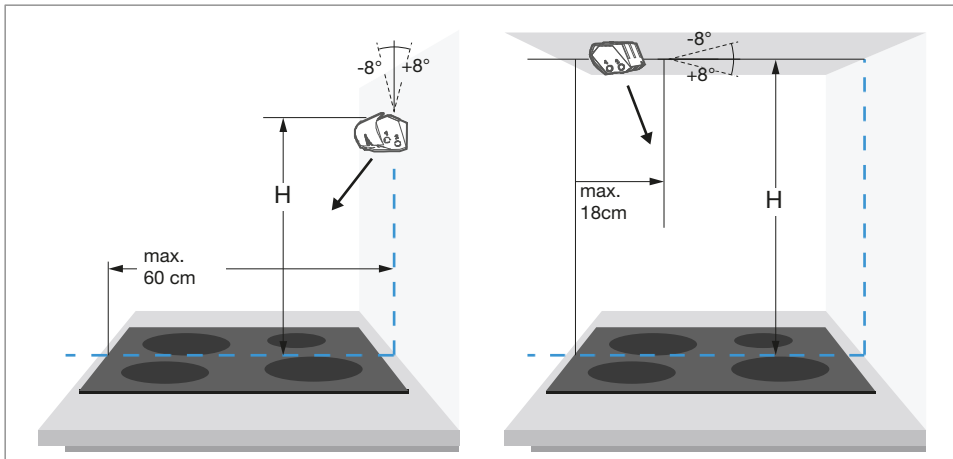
Wall installation (left); Installation under the extractor hood (right)
